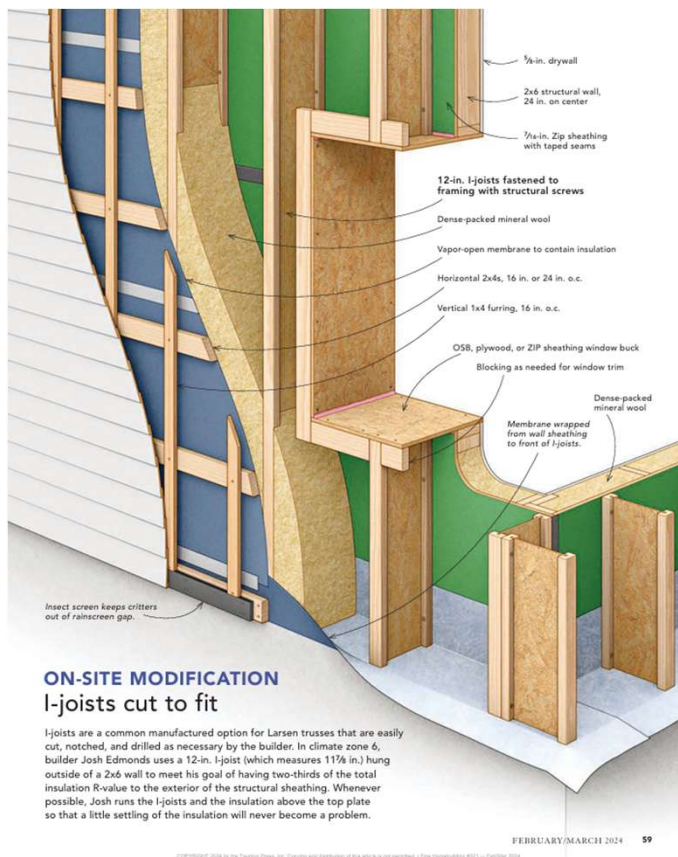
Trusses can be hung from the rafters and nailed to the existing wall
